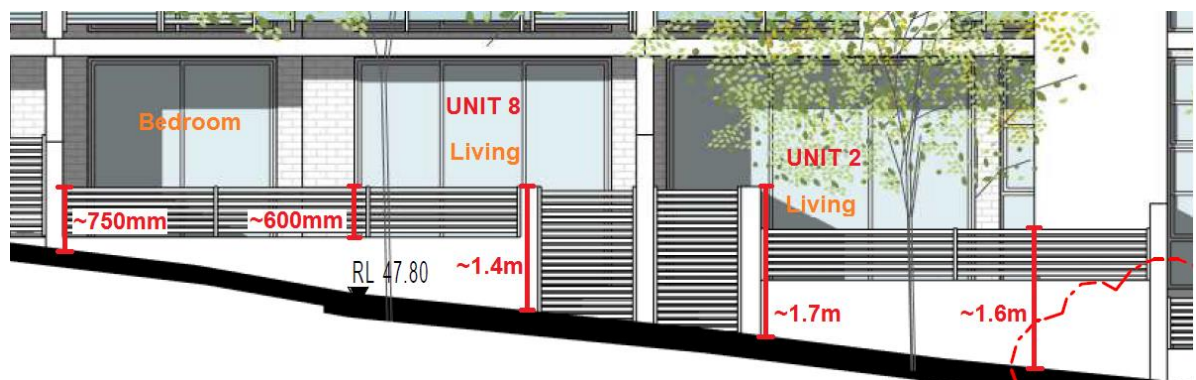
West Elevation Plan (Dwg No. DA11 (M)) showing fence heights outside Units 2 and 8 along The Avenue.
